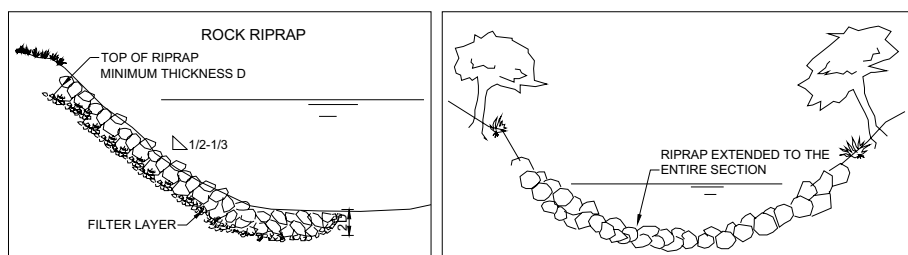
Bank protection with stone revetment and riprap extending over the entire cross section
